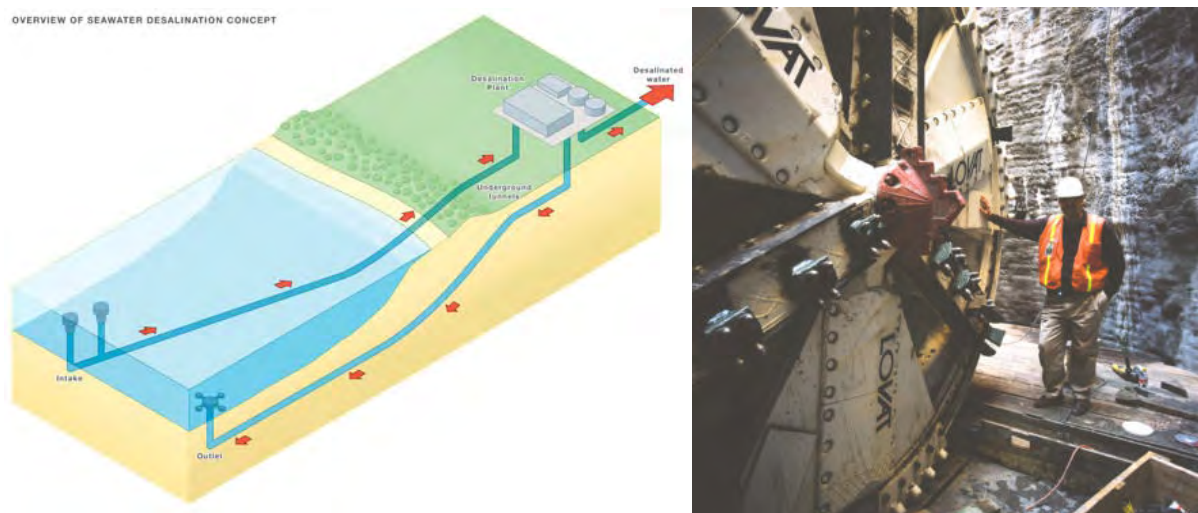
Schematic of Intake and Outlet Tunnels and Example of Tunnel Boring Machine
